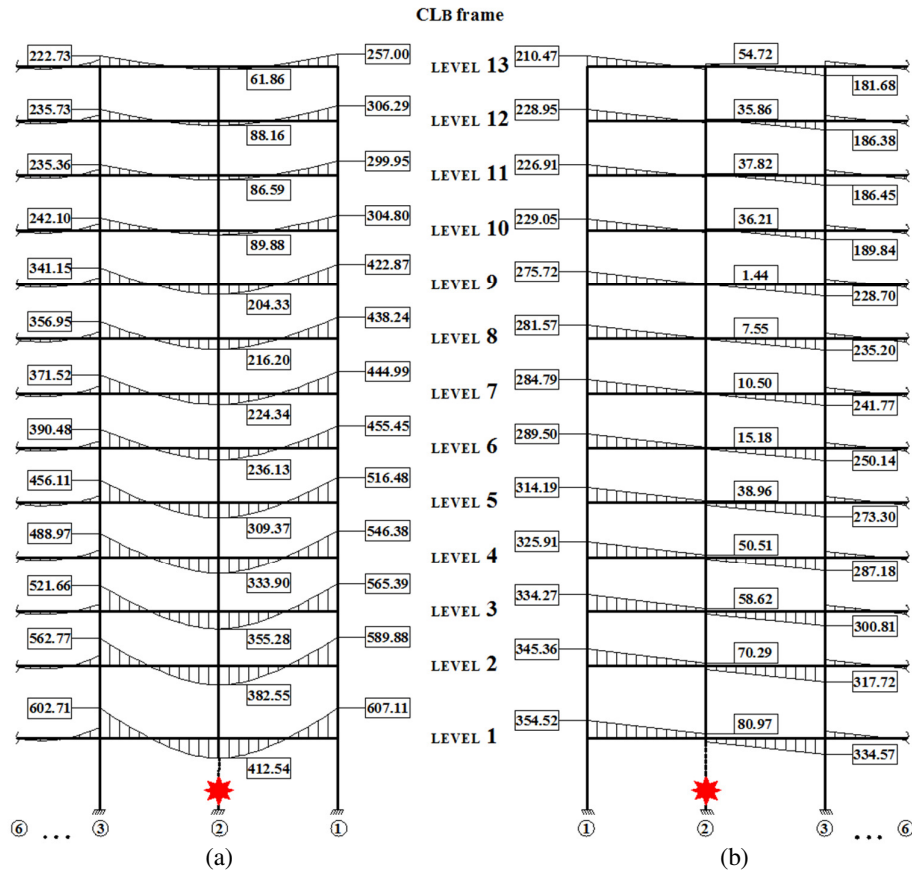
Damaged structure – longitudinal frame CL_B: a) bending moments [kNm]; b) shear forces [kN]
